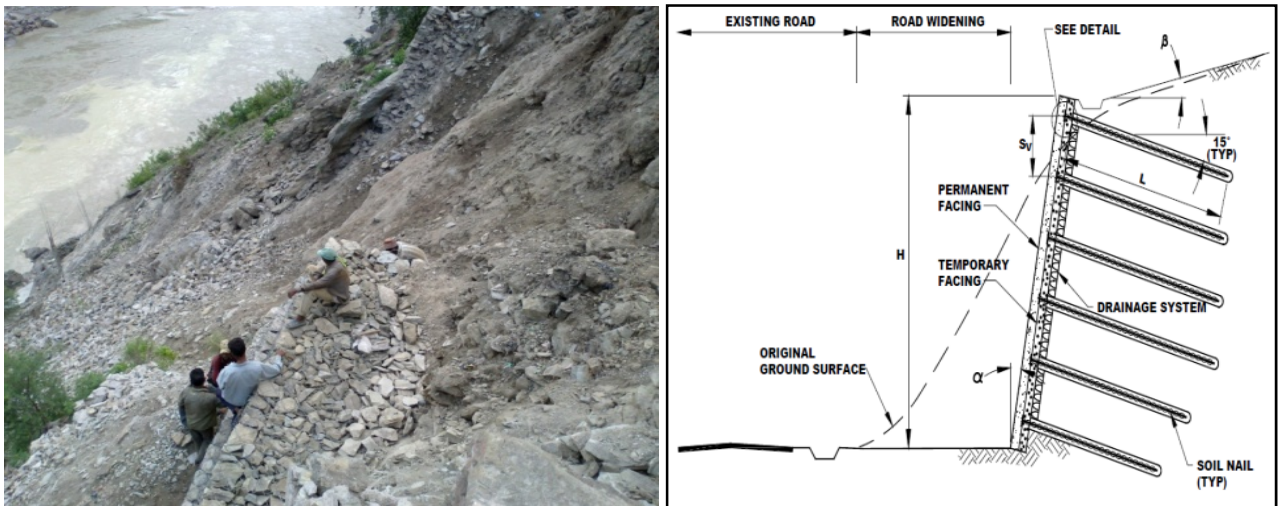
Reconstruction along NH-58 at Devprayag, where conventional Sauchase walls are being placed in July 2013, which is not going to be effective in the long run. Instead Reinforced soil or nailing technique could make the slope more stable and cost effective
